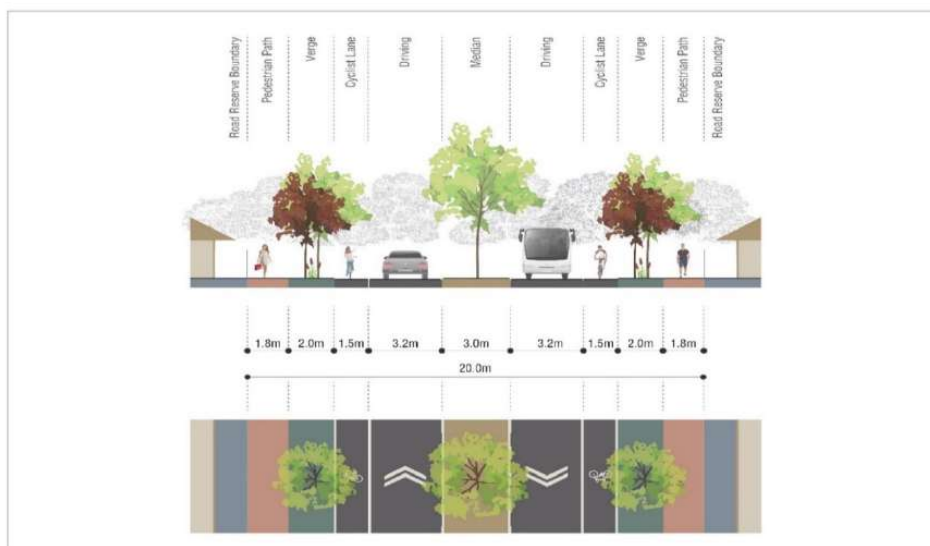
RD03 Maida Vale Road (East of Milner Road), RD04 Maida Vale Road (Milner Road to Raven Street) and RD05 Maida Vale Road (West of Ibis Place)
